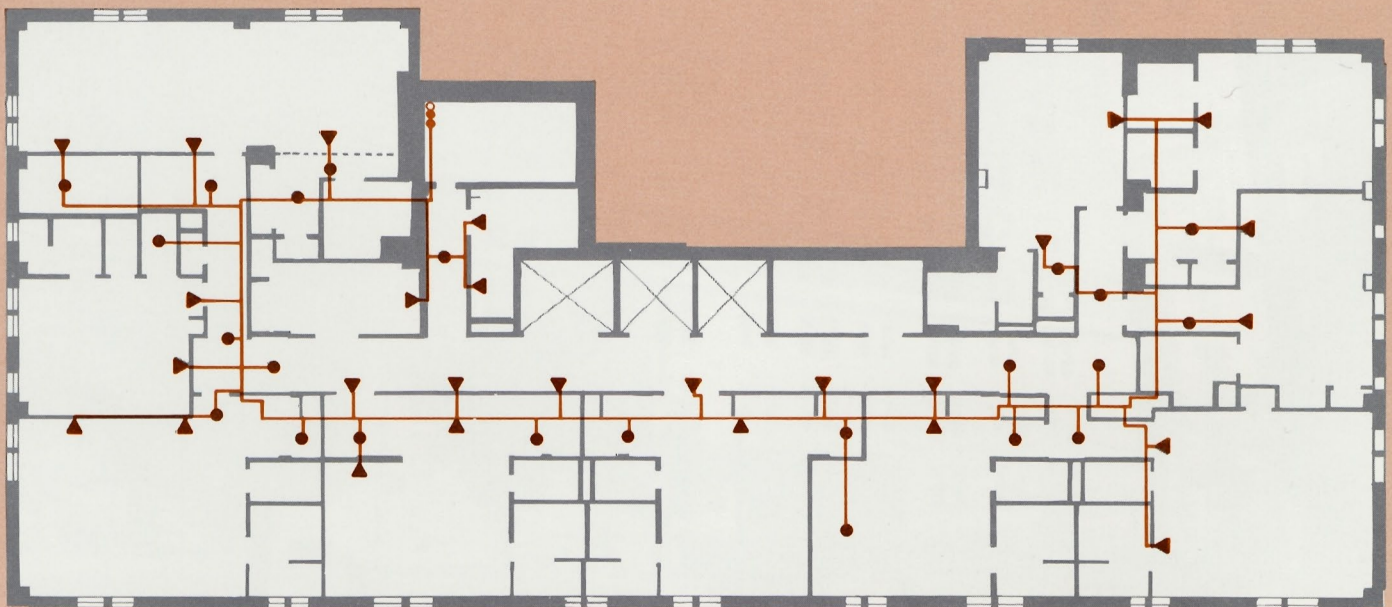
Sprinkler plan for typical floor in Peabody Court Hotel.
